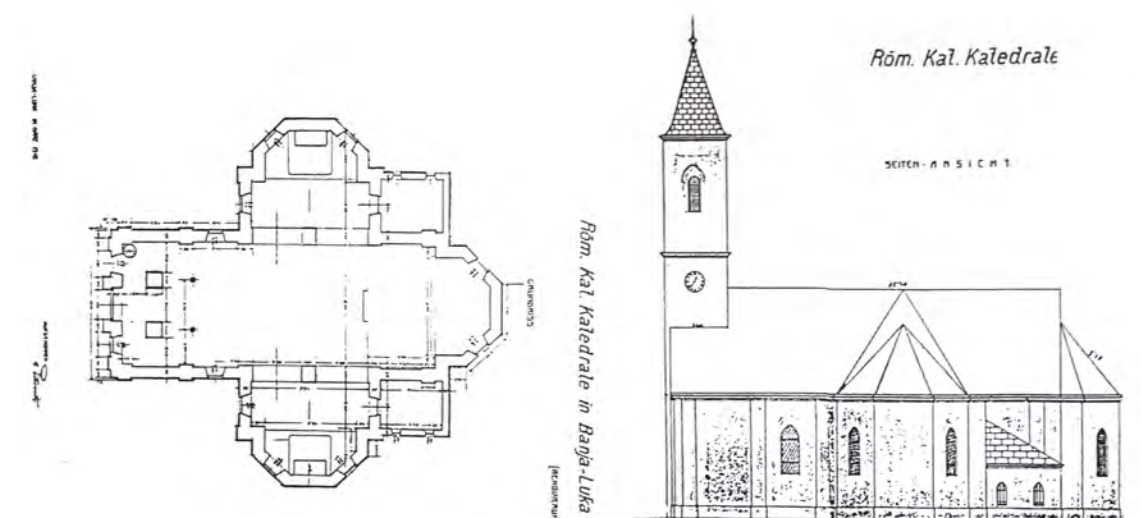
Cathedral of Saint Bonaventura; ground floor plan and elevation view from south.
